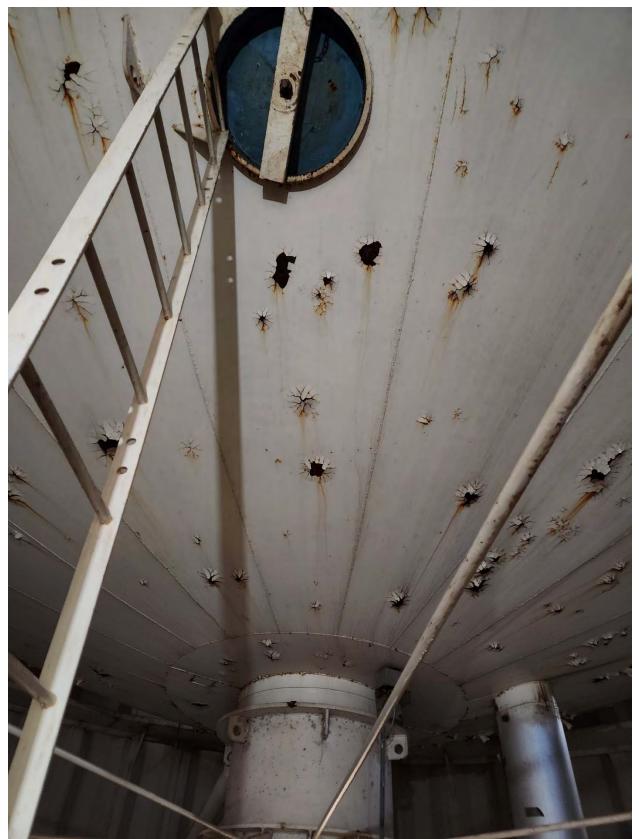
Interior Dry Bottom of Bowl, Wet Riser / Inlet/Outlet Pipe, and Overflow Pipe
